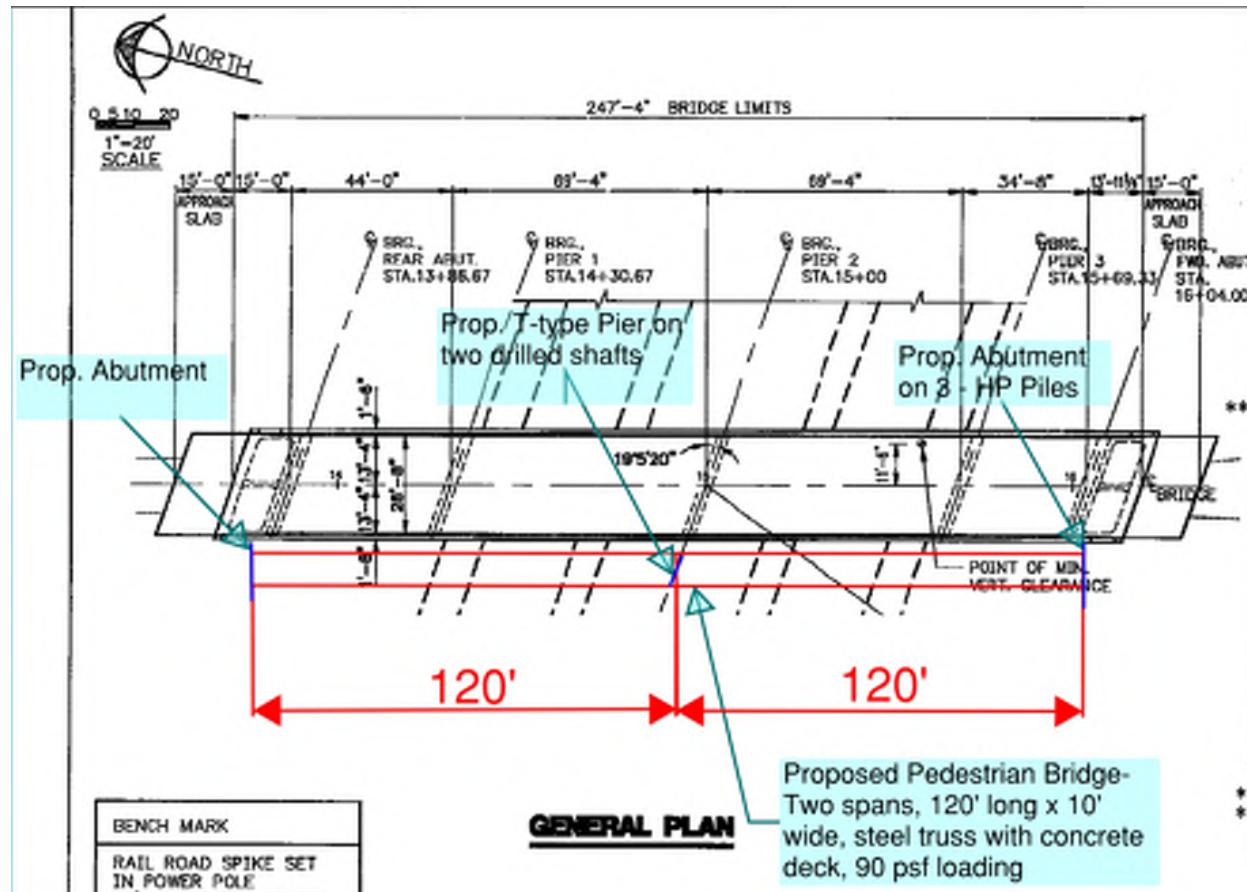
Proposed Pedestrian Bridge - Plan View MP 182.1
